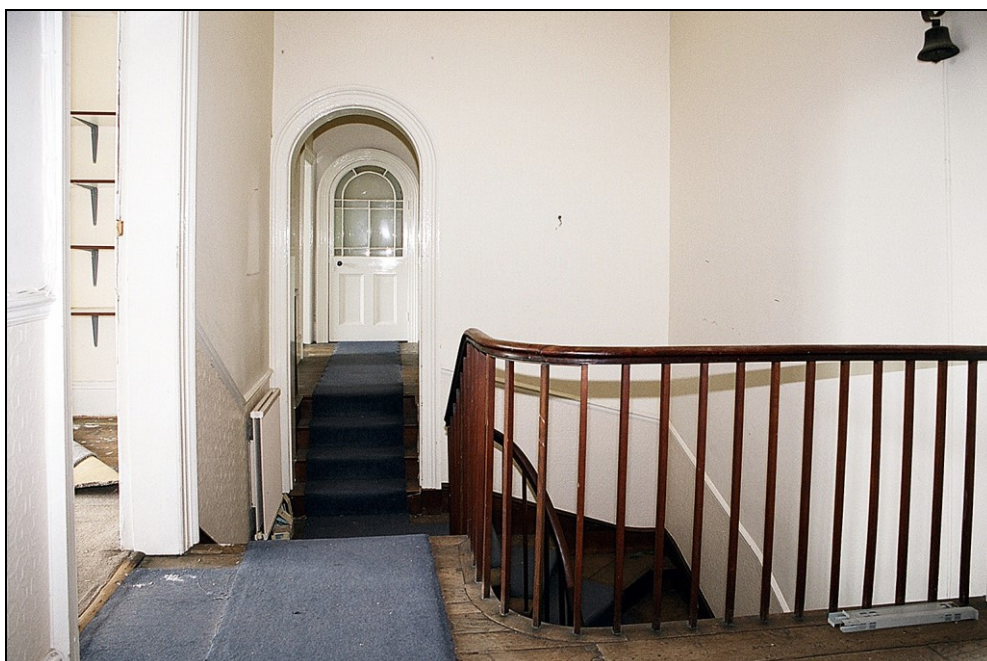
View looking S showing first-floor landing with open-well staircase in foreground
